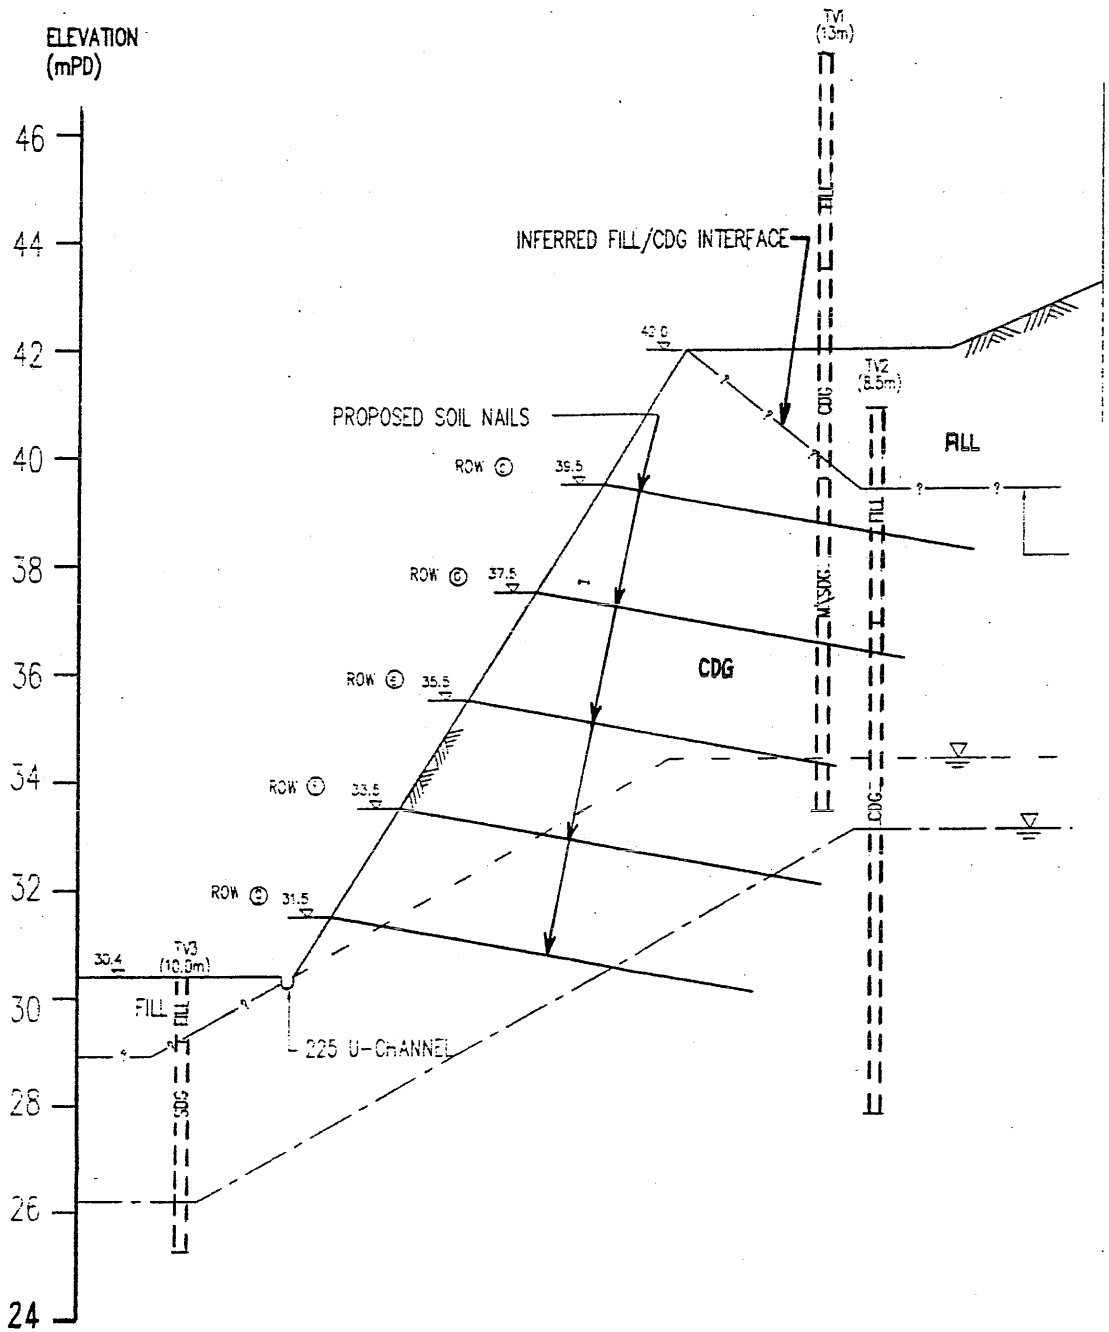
Section B-B of slope 11SE-A/C172 at Tanner Hill Estate.
